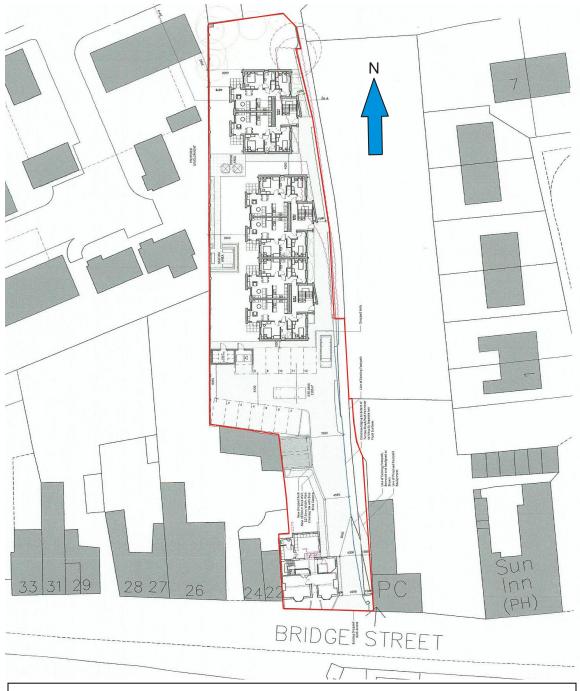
Block plan showing the proposed layout of the development site at an original scale of 1:200 at A1, (extract from Architects plan)
